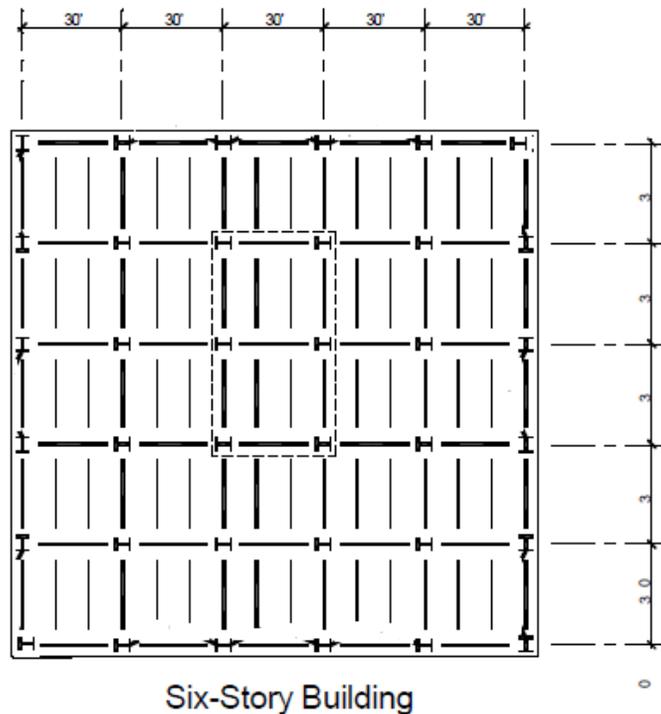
The plan view of six-story moment frame structure (Sabelli, 2001)
